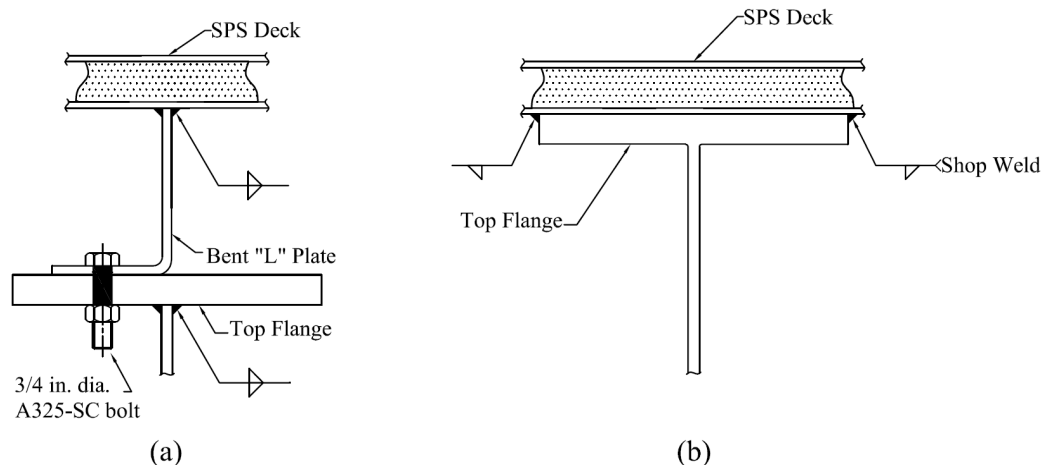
Deck-to-girder connections used in SPS bridge deck applications
